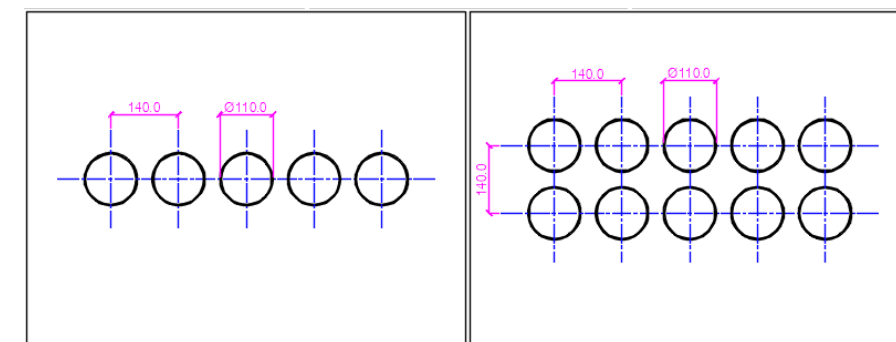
Underground cable pipe packages at the intersection with the railway UTC 1 and UTC2
